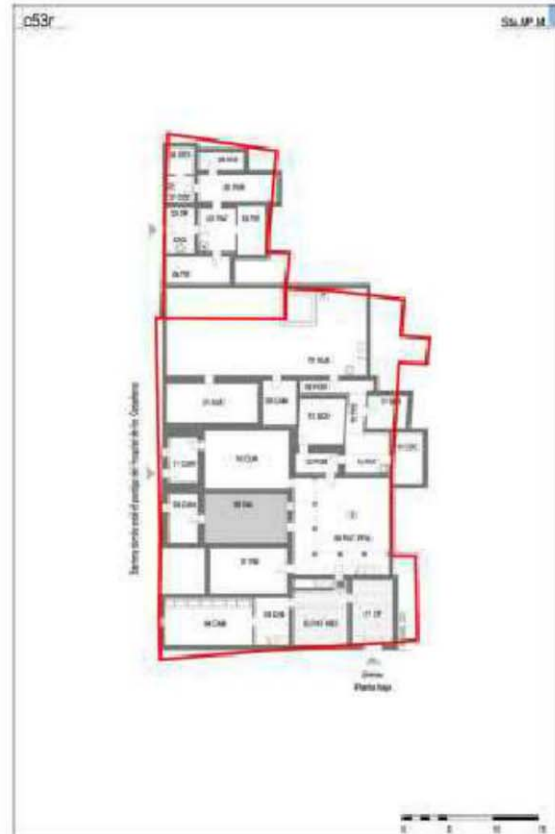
Drawing of the ground floor of the house c53r. Red line: current plot. Author: M. Núñez
